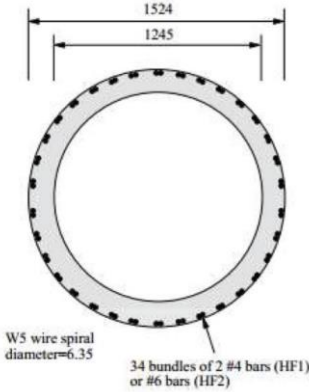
Hollow-Core Concrete Column with One Layer of Reinforcement (Hoshikuma and Priestley, 2000) (Dimensions in mm)
